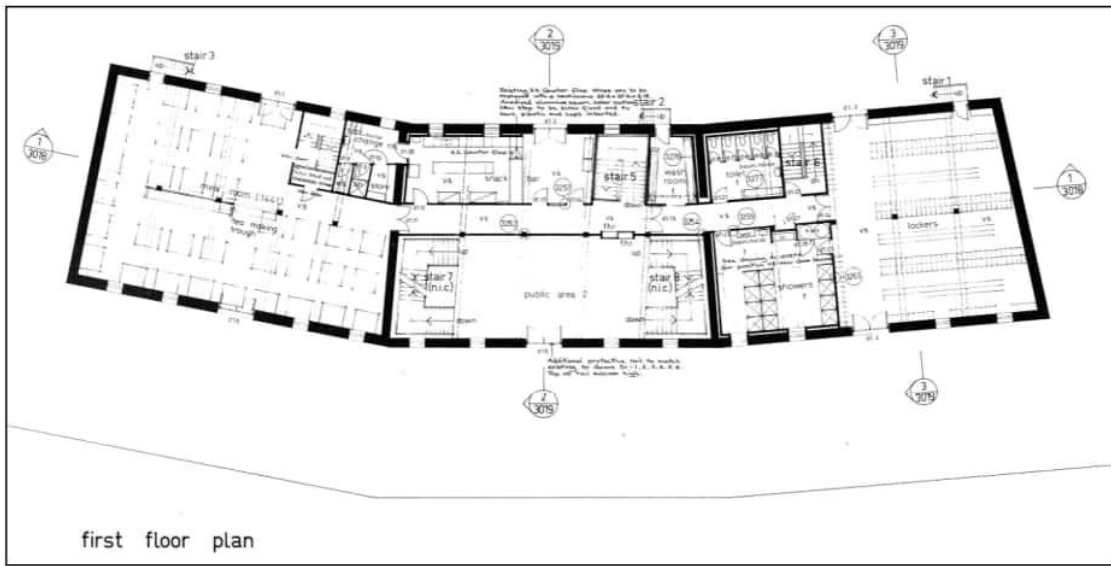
Extract of 1980 plan displaying the first floor plan of the Moore’s Wharf building after relocation (Source: Historical plans provided by GroupGSA)
